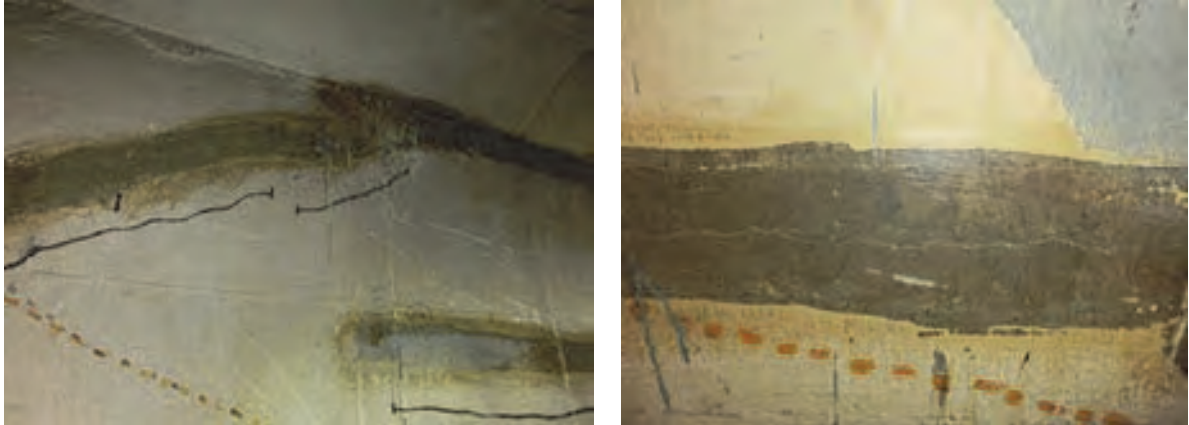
Cracks inside PC Box Girder
